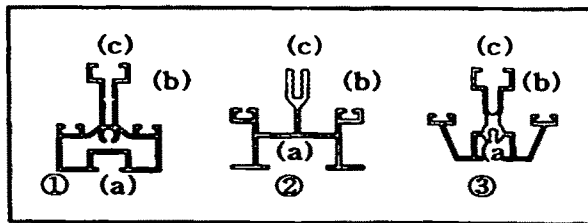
Cross-section shape of aluminium bar for glazing in glasshouse
